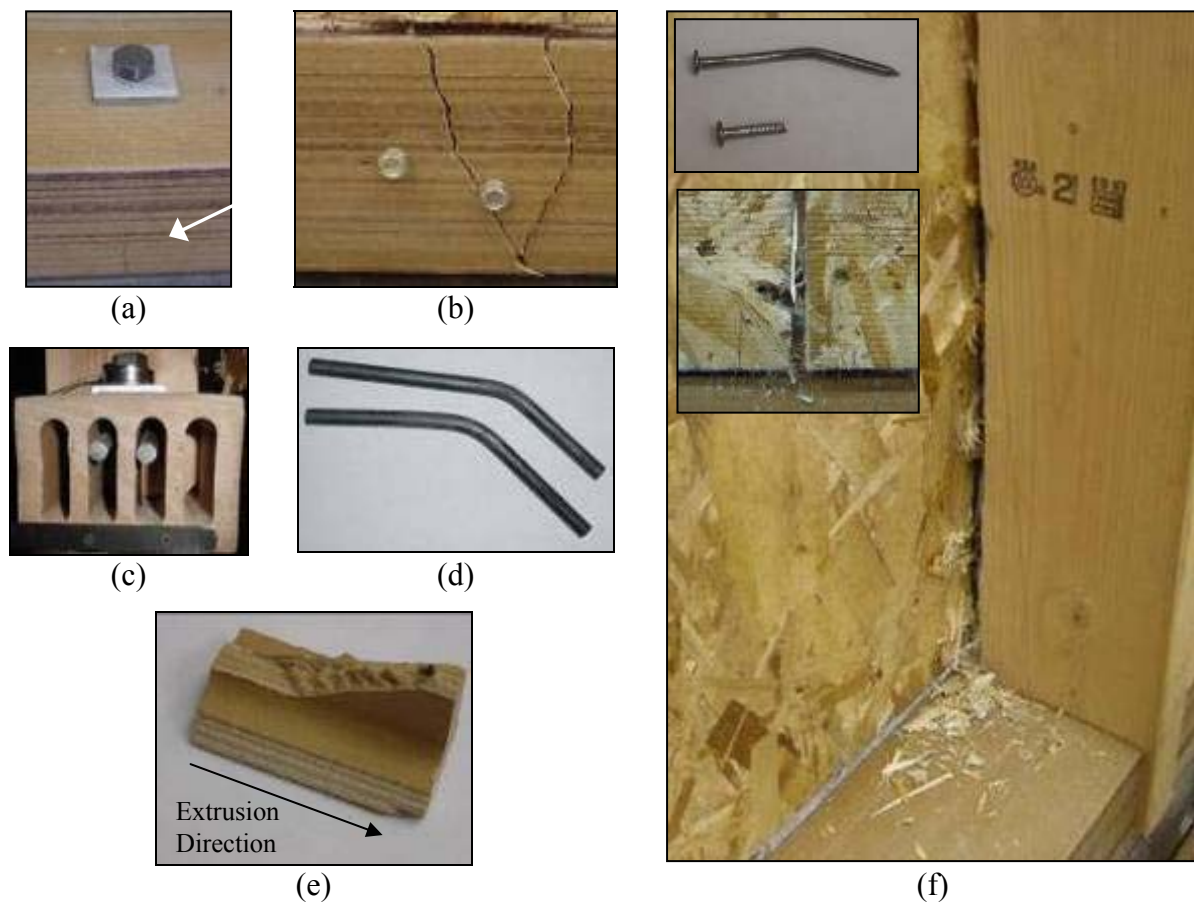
PP10 failures: (a) Flexural failure at interior anchor bolt, (b) Flexural failure at end stud connection, (c) End view of dowels yielding, (d) Yielded dowels from Test PP10-2, (e) Failure plane along section strands, and (f) Nail pull-through at panel joint (inset photos of yielded fasteners and view of panel joint from outside)
